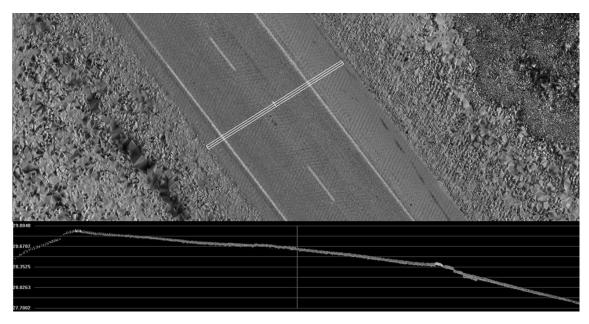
Road cross section extracted from point cloud (Amadori 2014)
